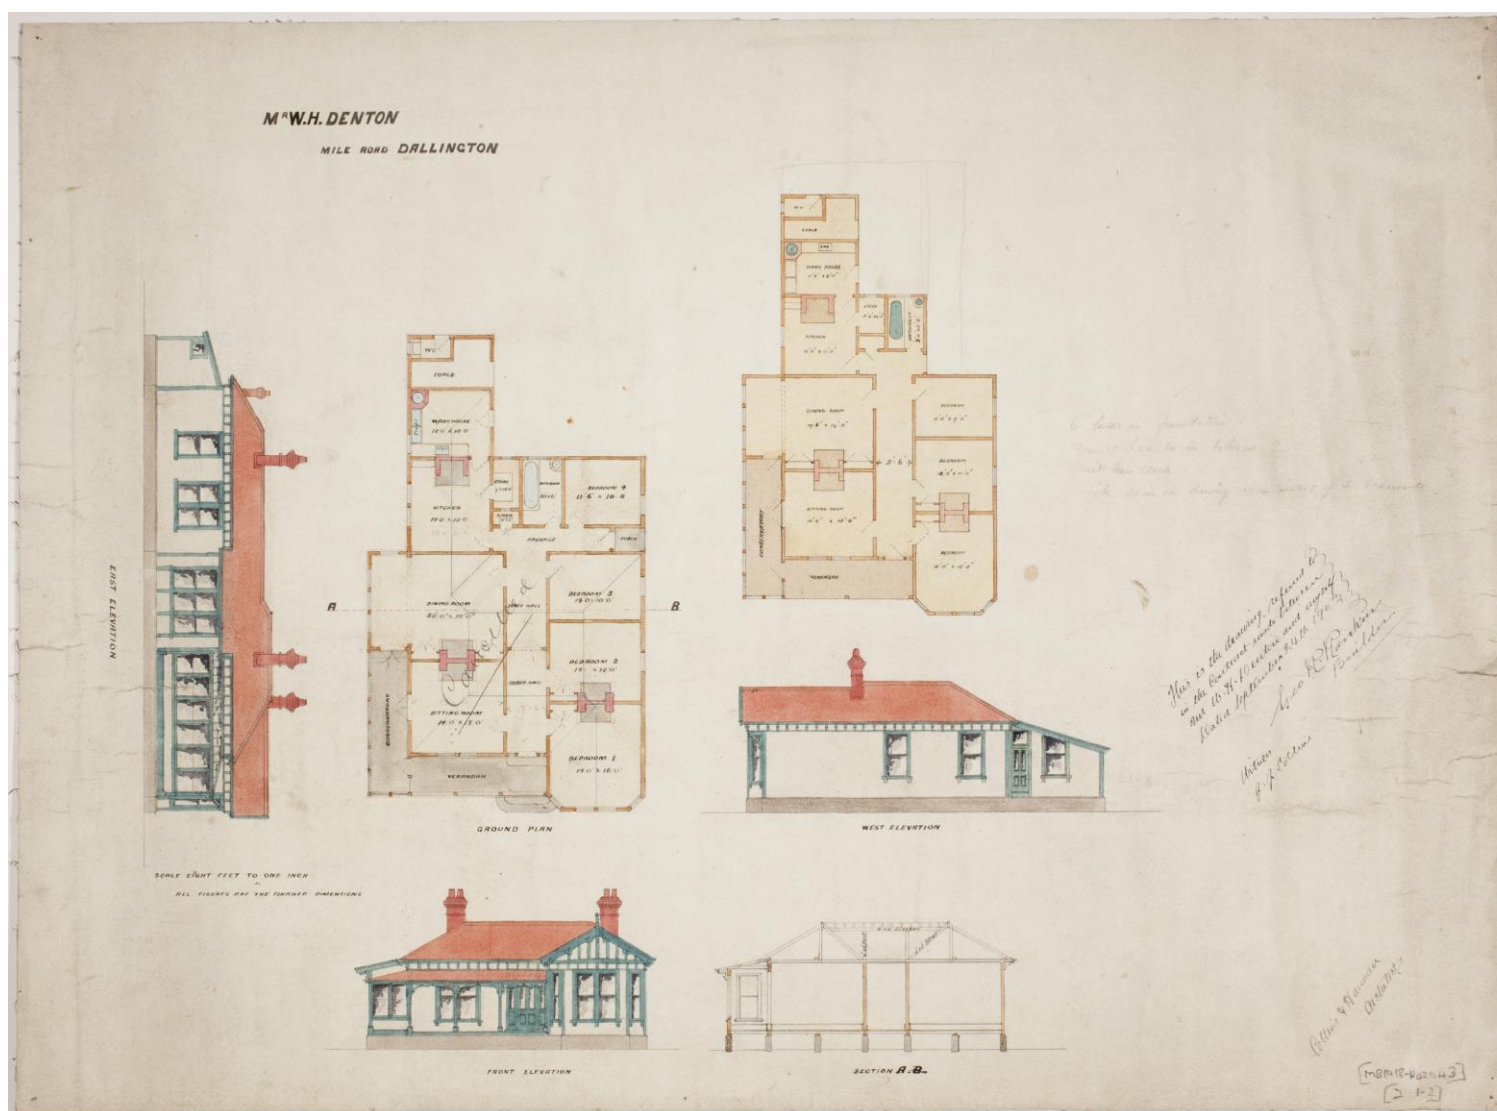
Collins and Harman, Mr W. H. Denton, Mile Road, Dallington, plans, elevations and section (1903).
